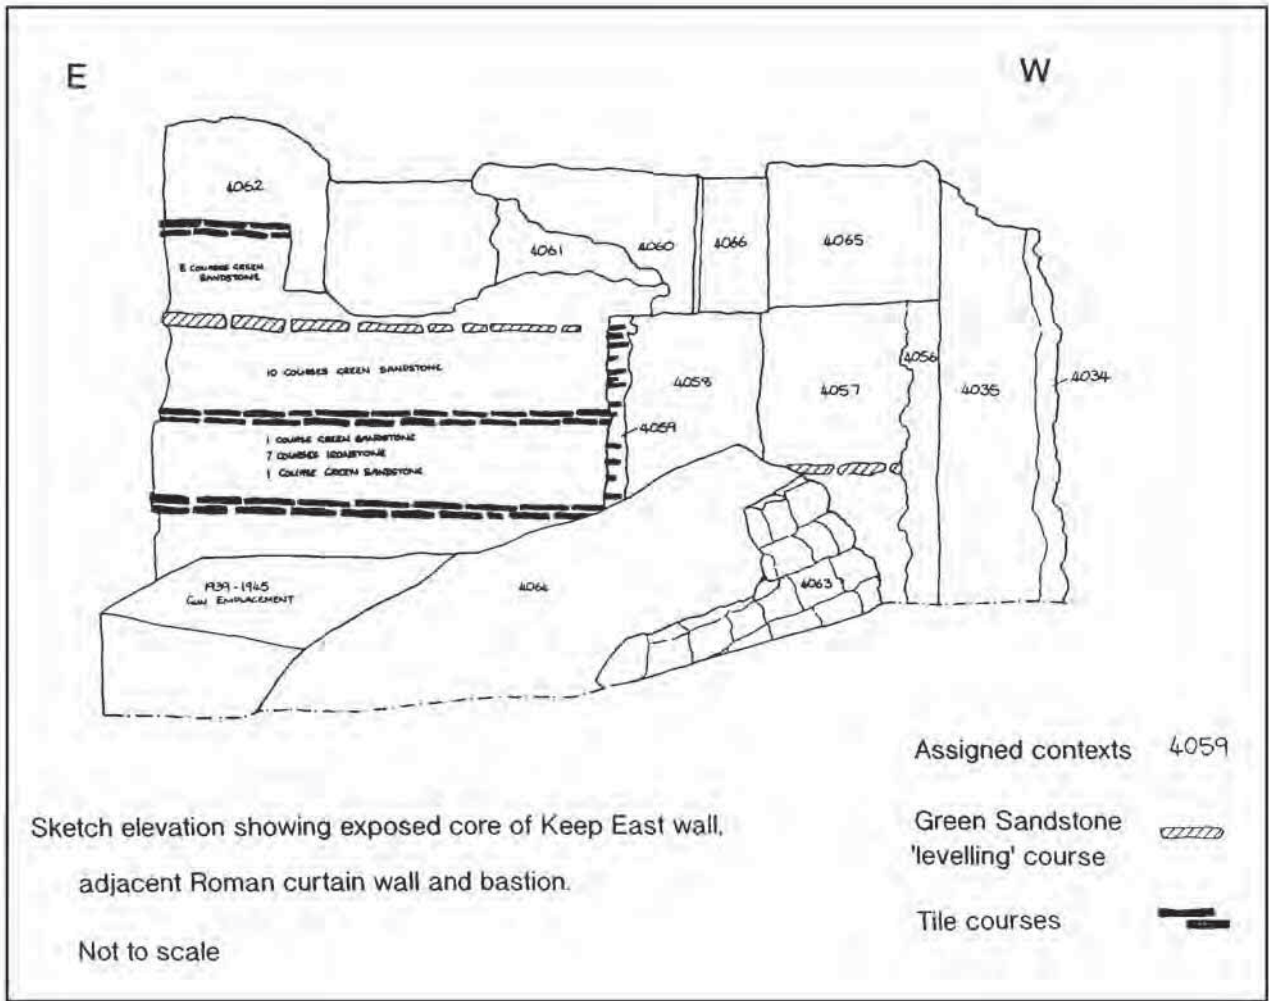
Sketch elevation of exposed core of Keep East wall adjacent to Roman curtain wall and bastion
